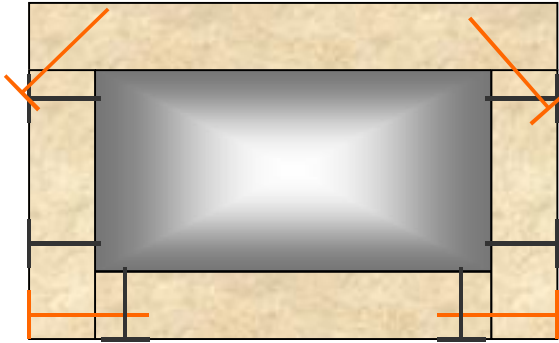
Positioning of the insulation slabs around the vertically installed duct
